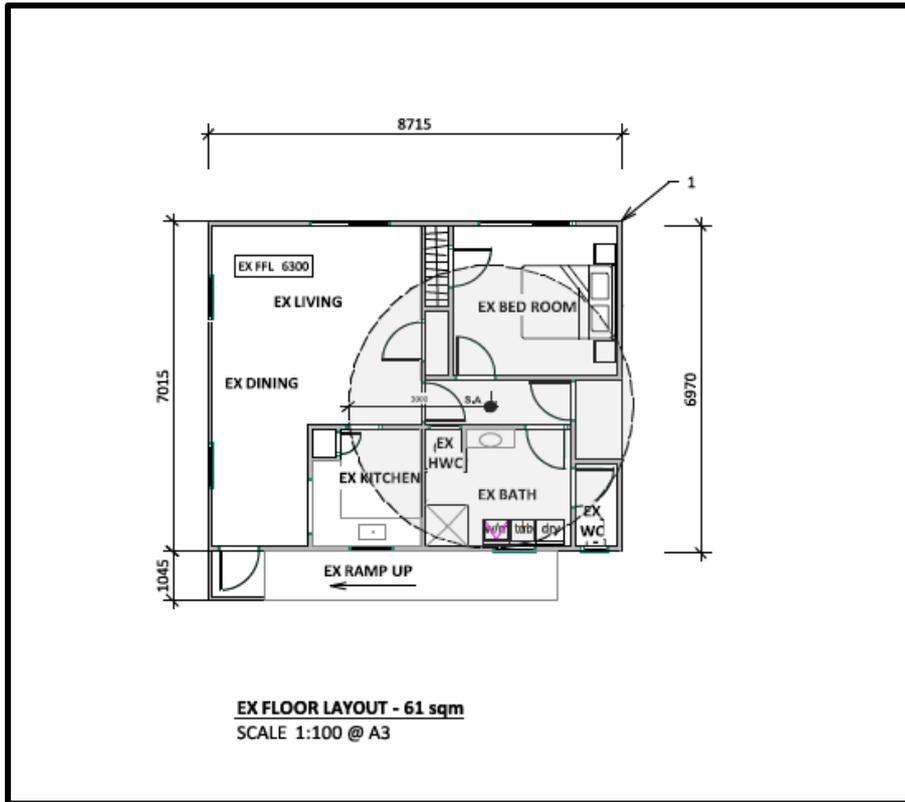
Existing Floor Layout. Source: Mealings Architecture Plan Set
